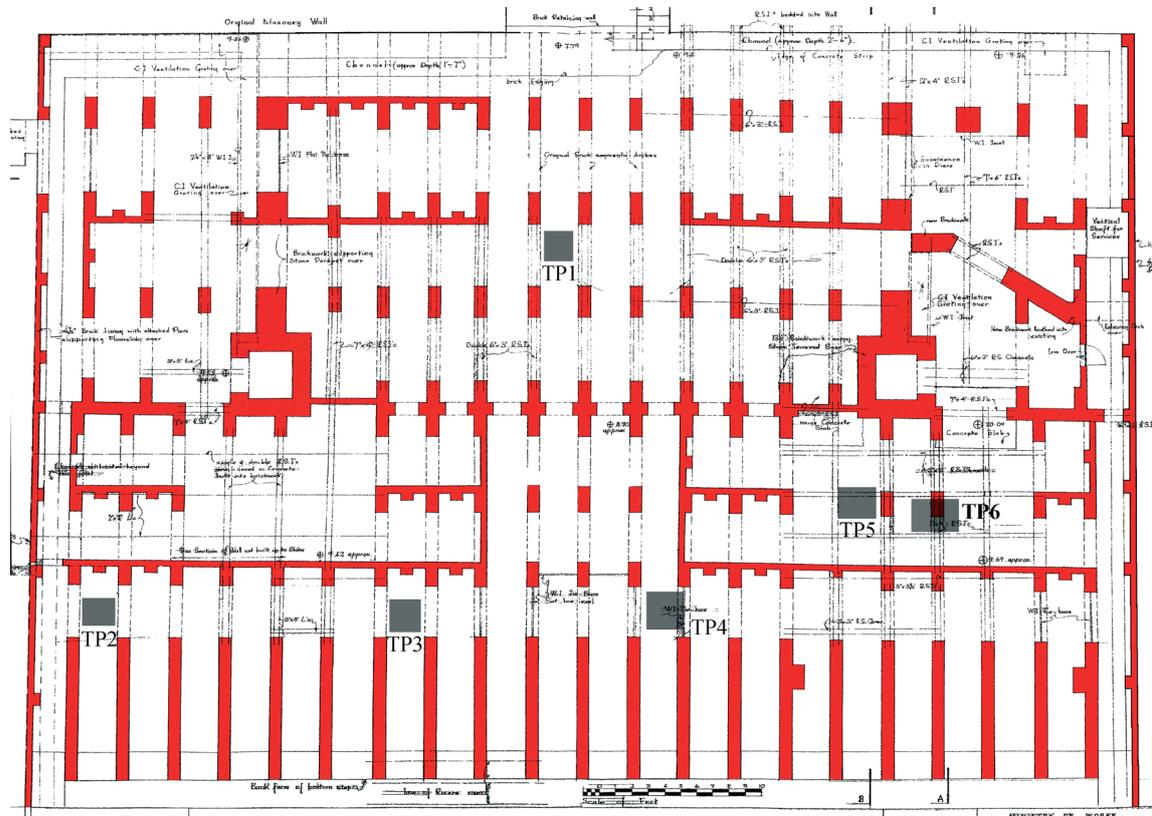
plan of South Steps showing locations of Test Pits (from Barry c. 1850)
